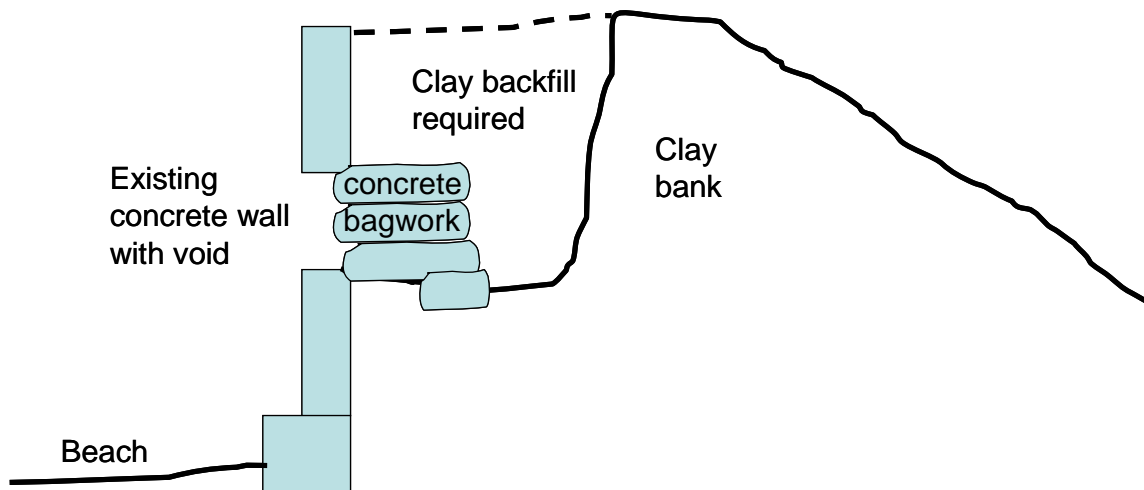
Sketch of solution to voiding in concrete wall and erosion of clay bank (Research Journal 1st August 2009)
